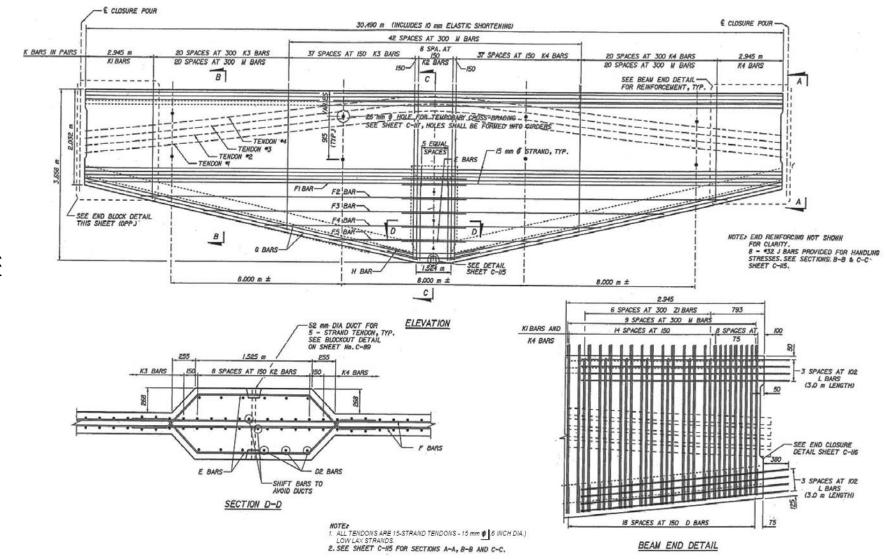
Illustration. Modified Florida bulb-T78 beam haunch segment.
